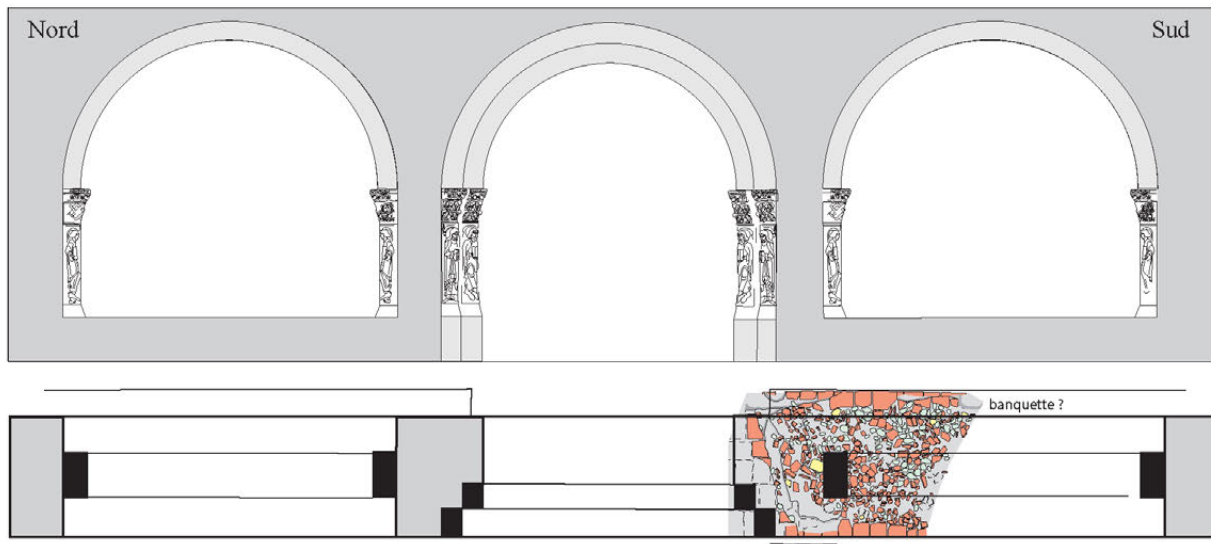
Toulouse (F), cathedral, suggested reconstruction of the chapter house façade (drawing Quitterie CAZES)
